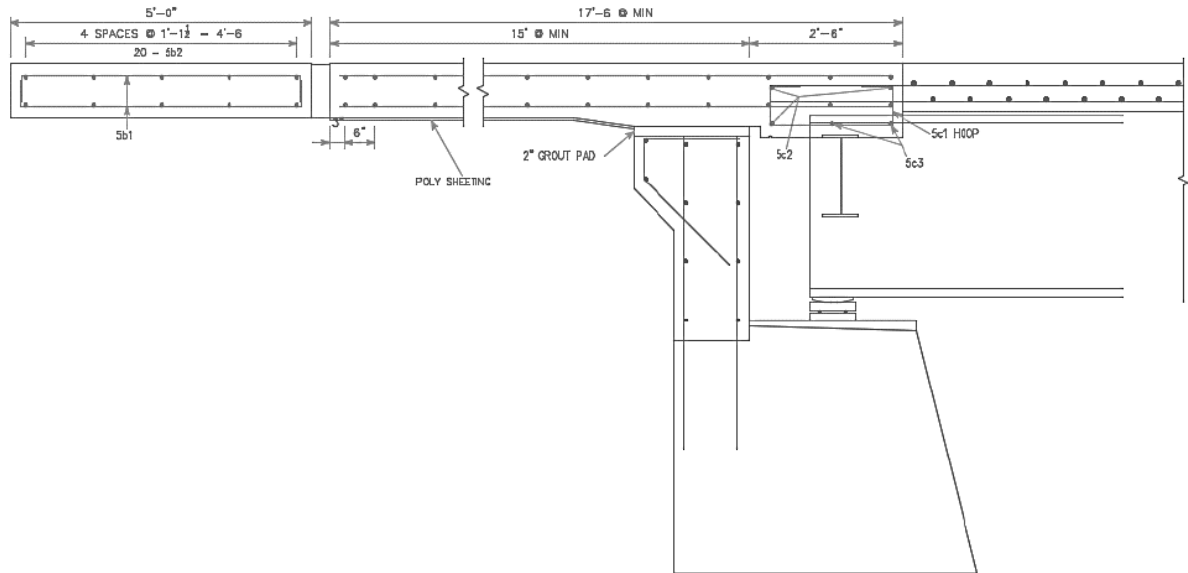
Preliminary approach slab detail developed by IowaDOT. Source: Iowa DOT.
